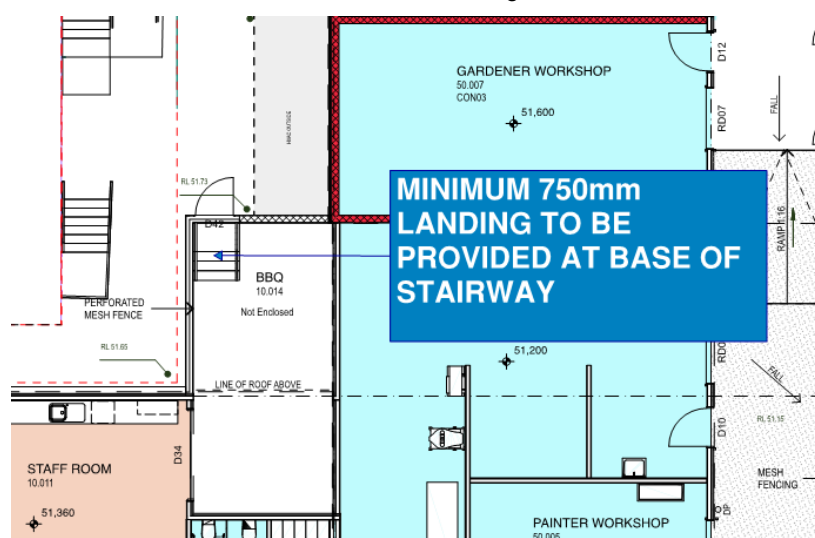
Minimum landing required to stairway leading from the BBQ area
